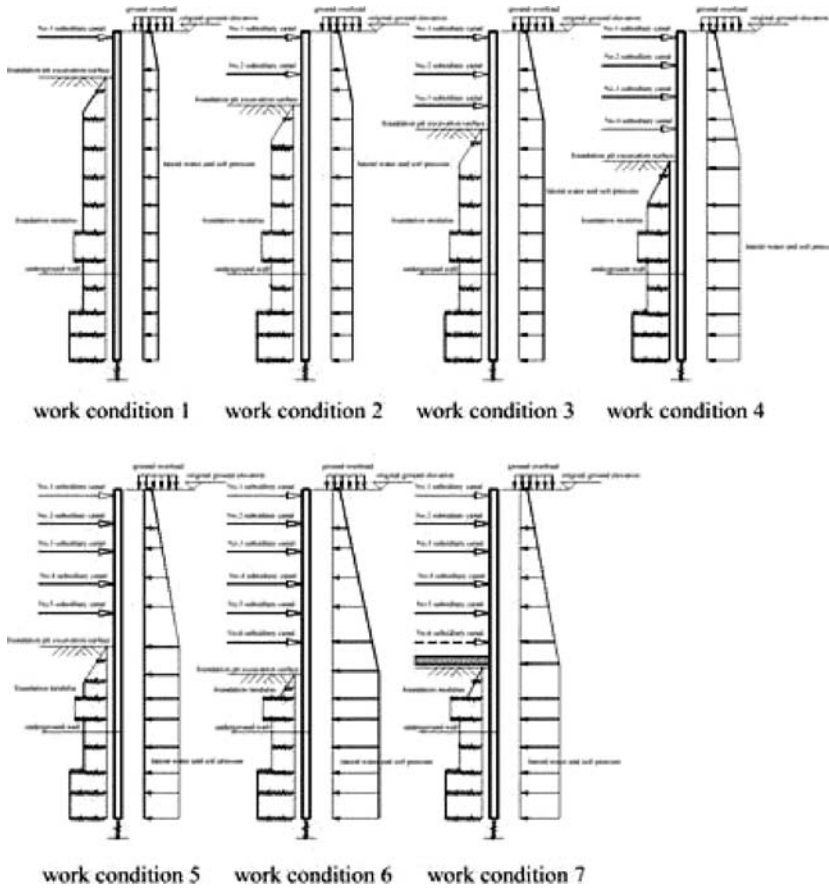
Calculation sketch of diaphragm walls in excavation stage.
